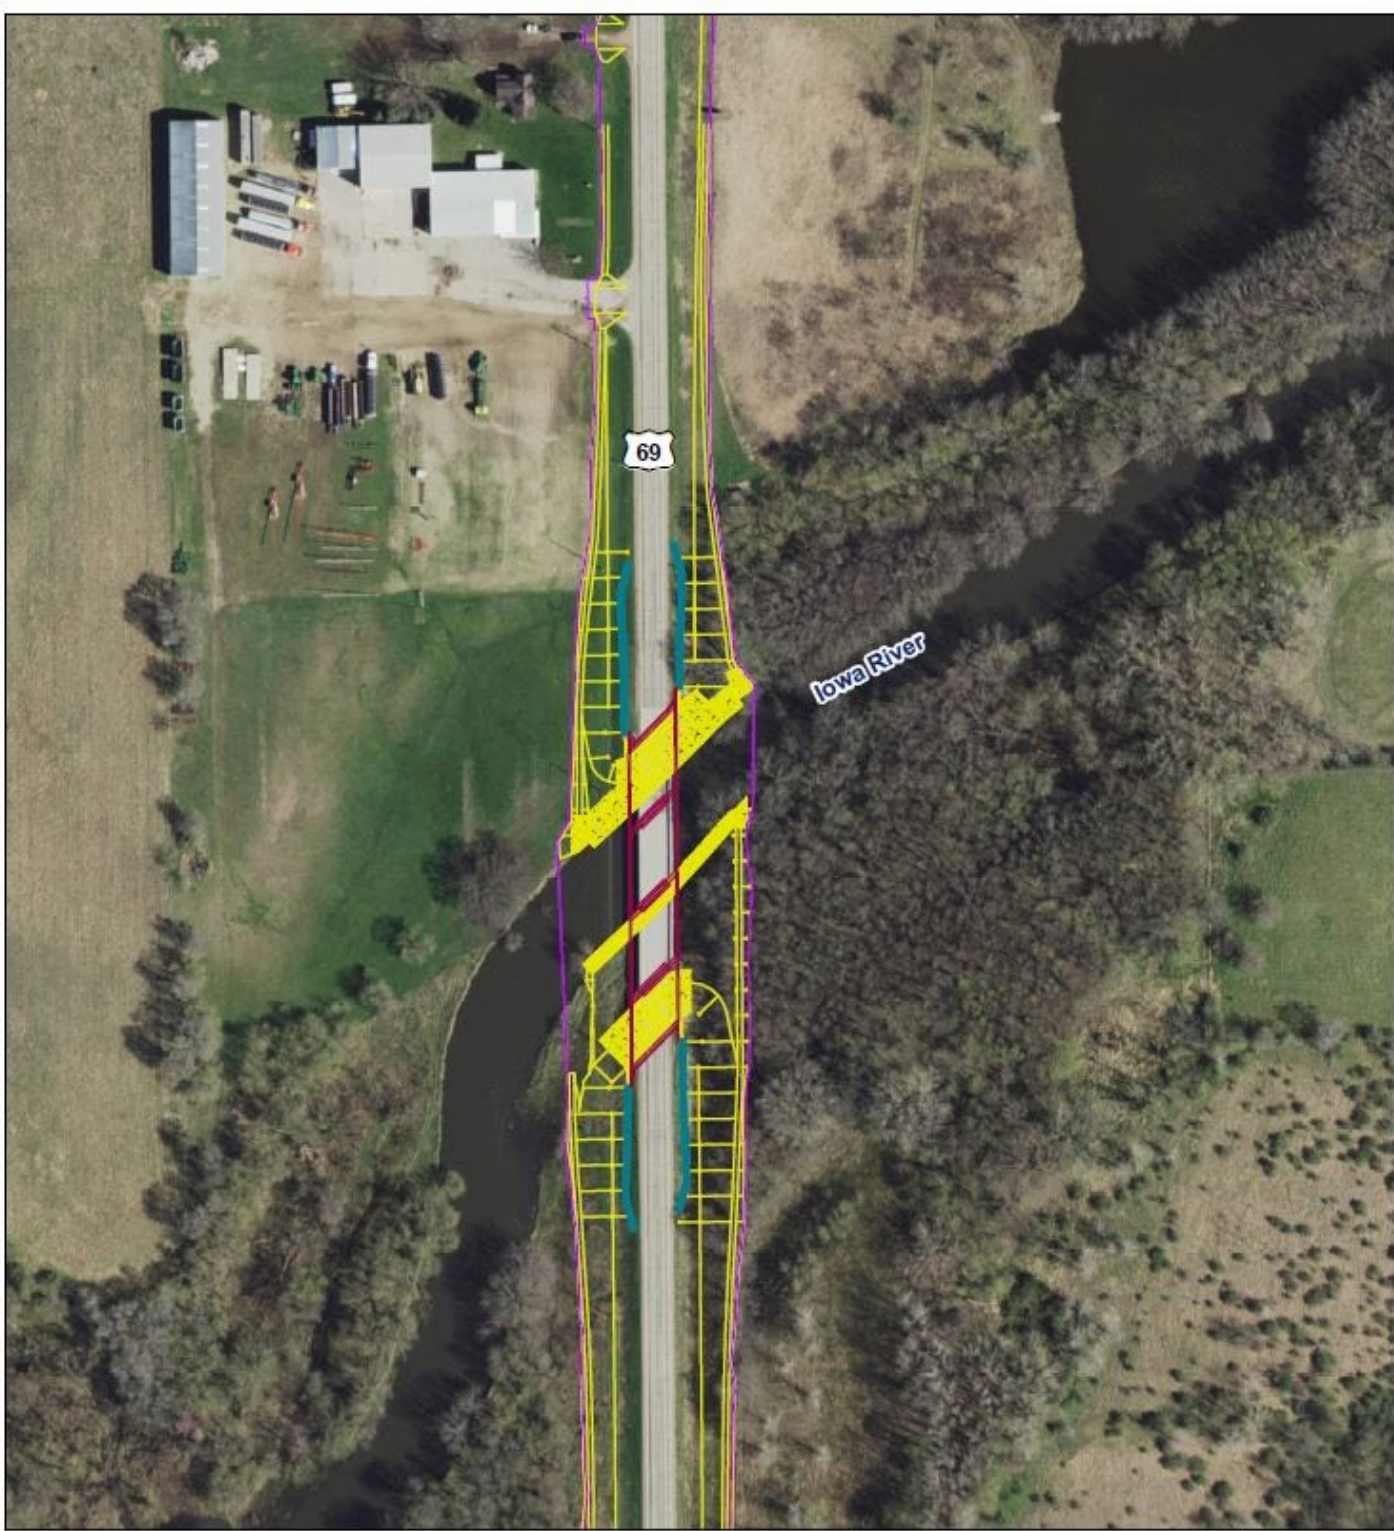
B. U.S. 69 over the Iowa River Bridge in Belmont, Wright County, Iowa.
